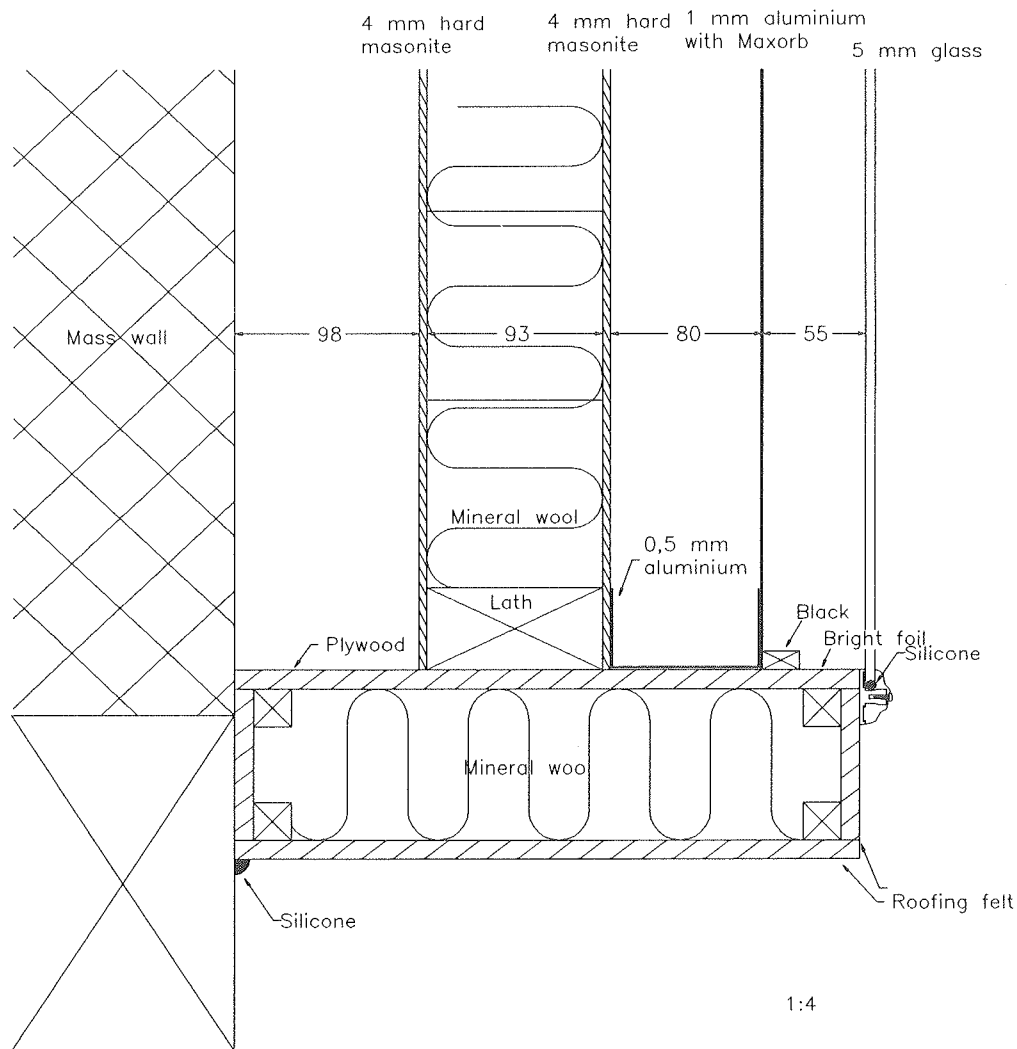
Horizontal section. Details of the side of the internally ventilated Trombe wall.
